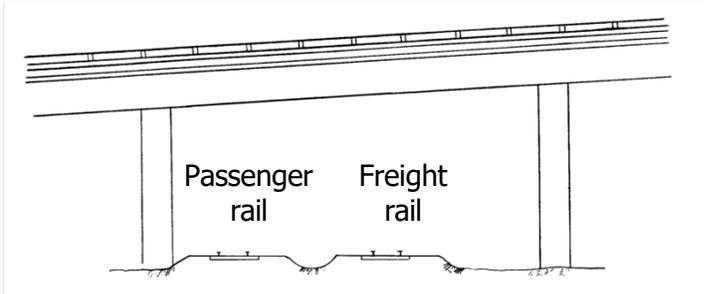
Bridge elevation view with one passenger rail and one freight rail track below the bridge.
